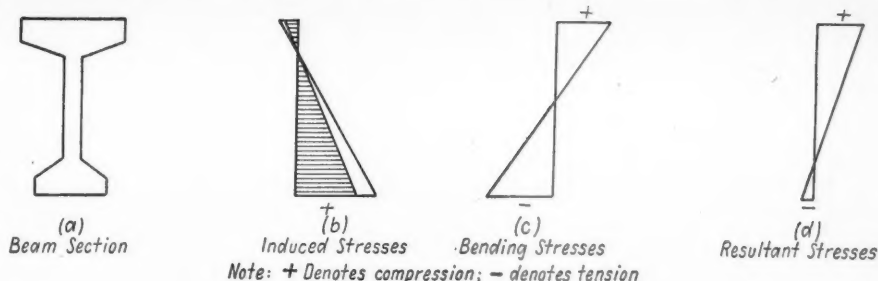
These sketches illustrate the principle involved when the reinforcing in a concrete beam is prestressed
